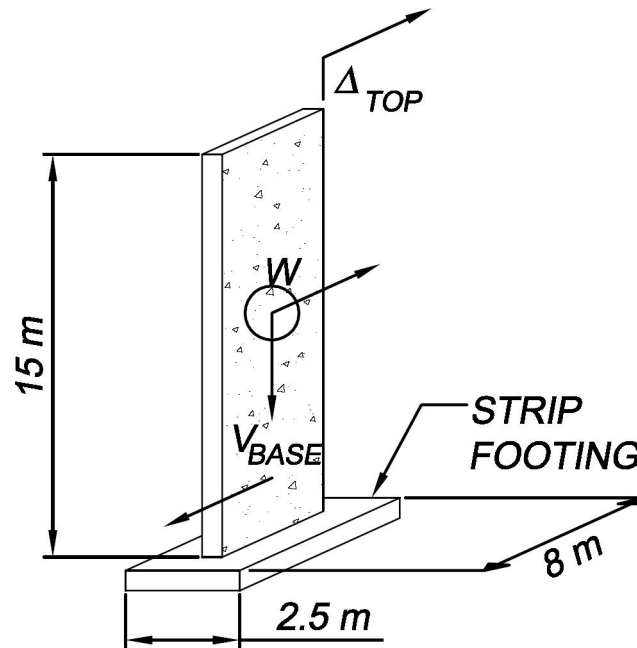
Dimensions of 5-story shear wall – shallow foundation system selected for design example
